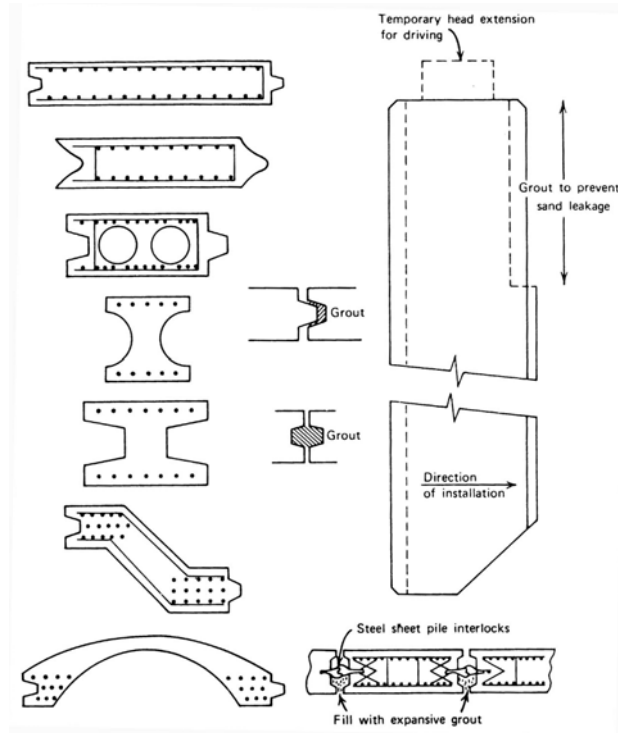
Typical cross sections used for prestressed concrete sheet piles (Ref 42)
